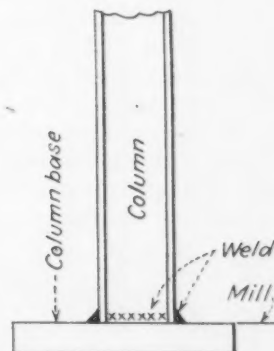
Where heavy base plates are milled, assuring a good column bearing, there is no necessity to weld the web section of an H-column to that base.
